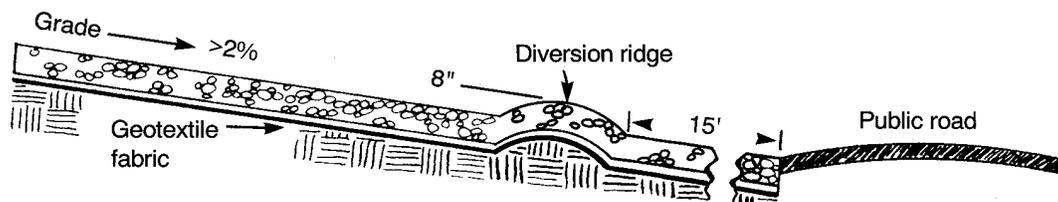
Cross-section of a Construction Entrance/Exit (NC, 1993)
